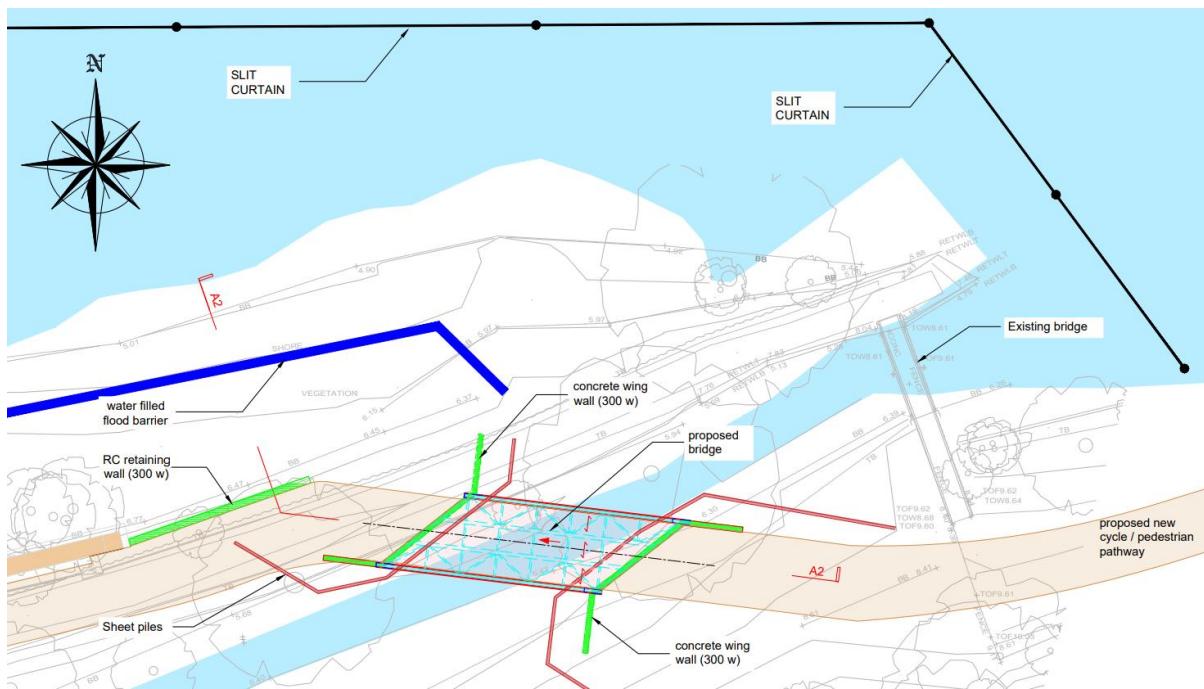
Plan of proposed Bridge 5 and proposed Ramp, showing proposed Silt Curtain, Sheet piles and water filled flood barrier (refer to drawing RHA-XX-DR-S-SP0052)
